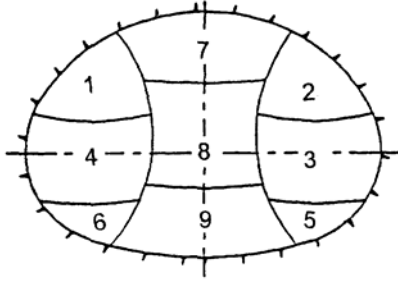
Twin side drift and central pillar excavation method. Temporary support consists of double wire mesh reinforced 250 - 300 mm thick shotcrete shells with embedded lattice girders or HEB 160 steel sets at 0.75 - 1 m spacing.
